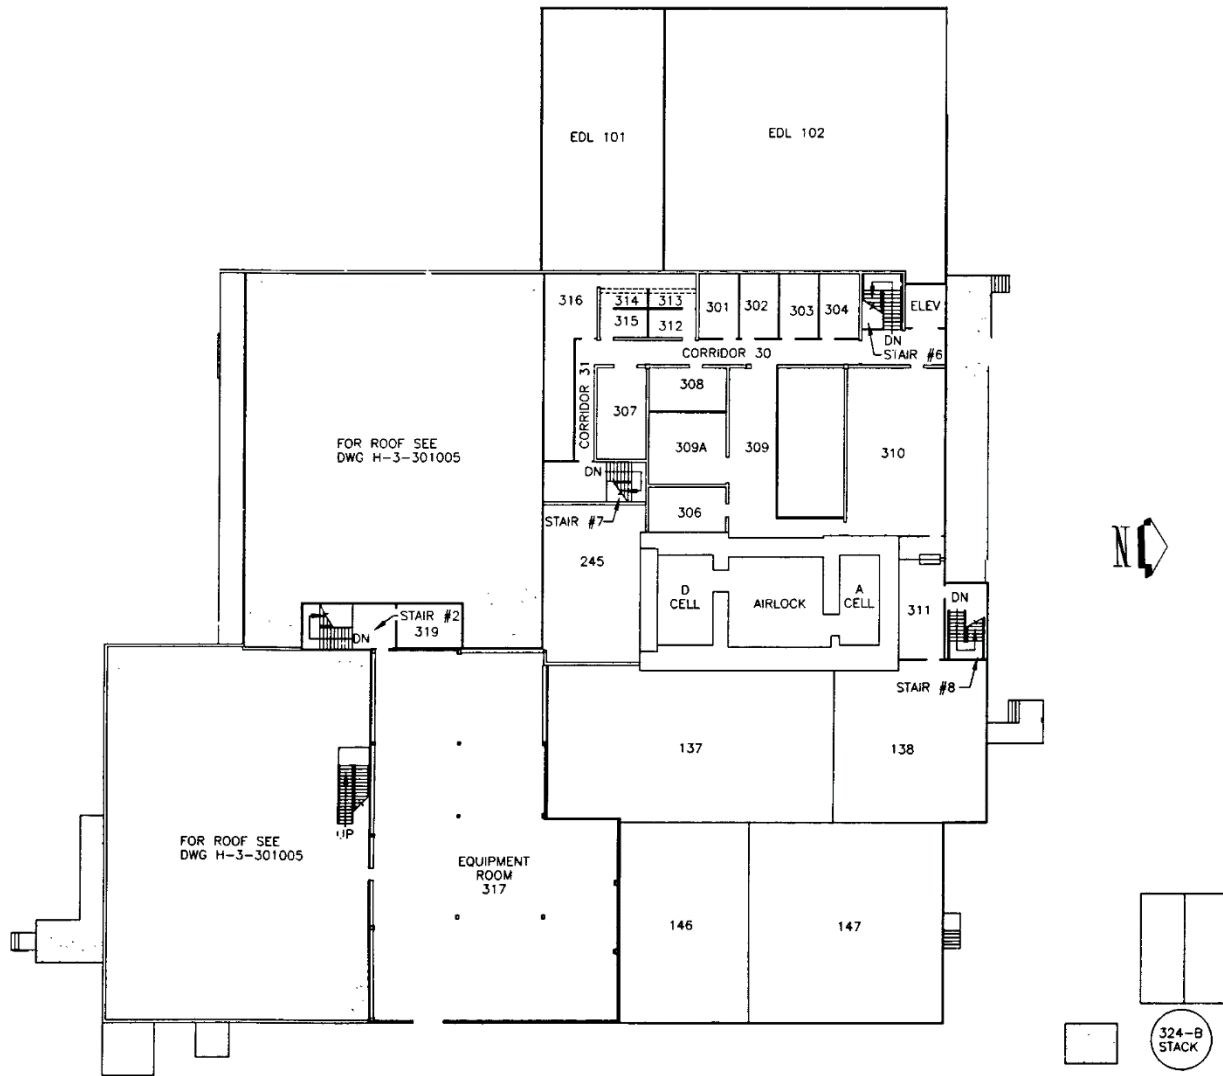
324 Building Simplified Floor Plan (Third Floor)
